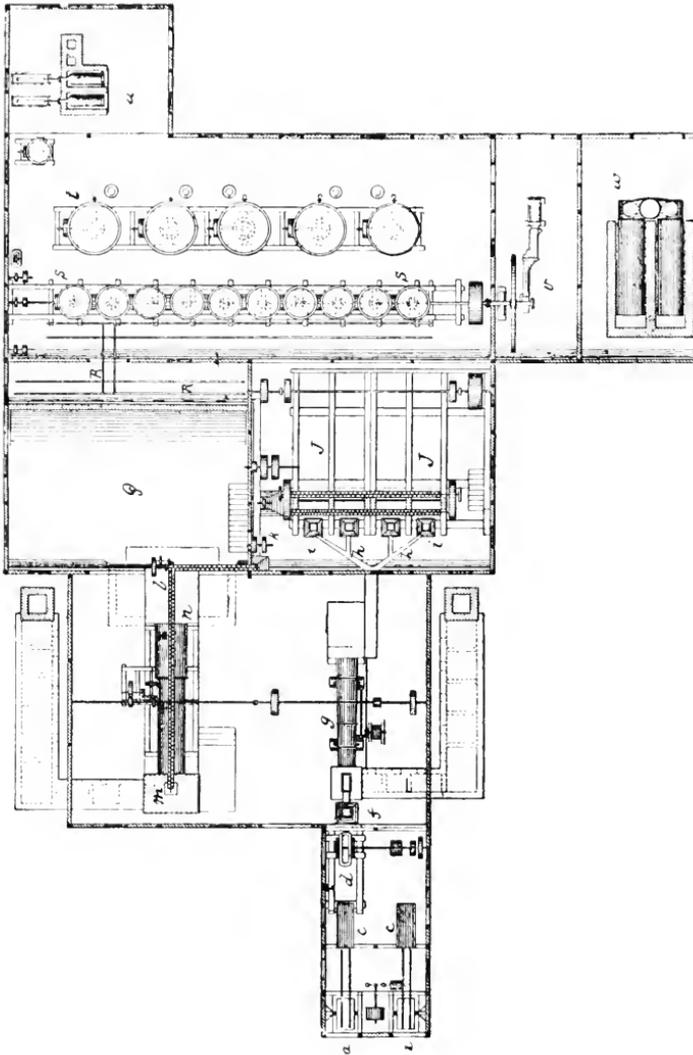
GROUND PLAN OF 20-STAMP DRY CRUSHING SILVER MILL.
